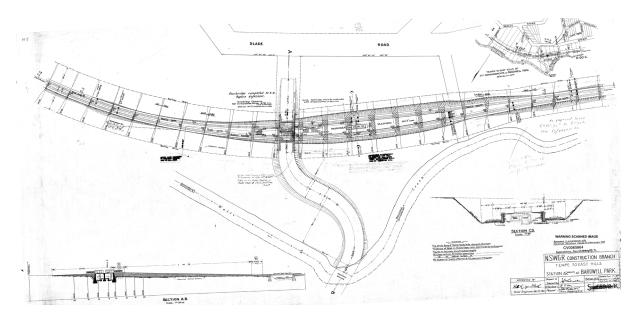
NSWGR Tempe to East Hills – station arrangements, c. 1930 (Virtual Plan Room).
